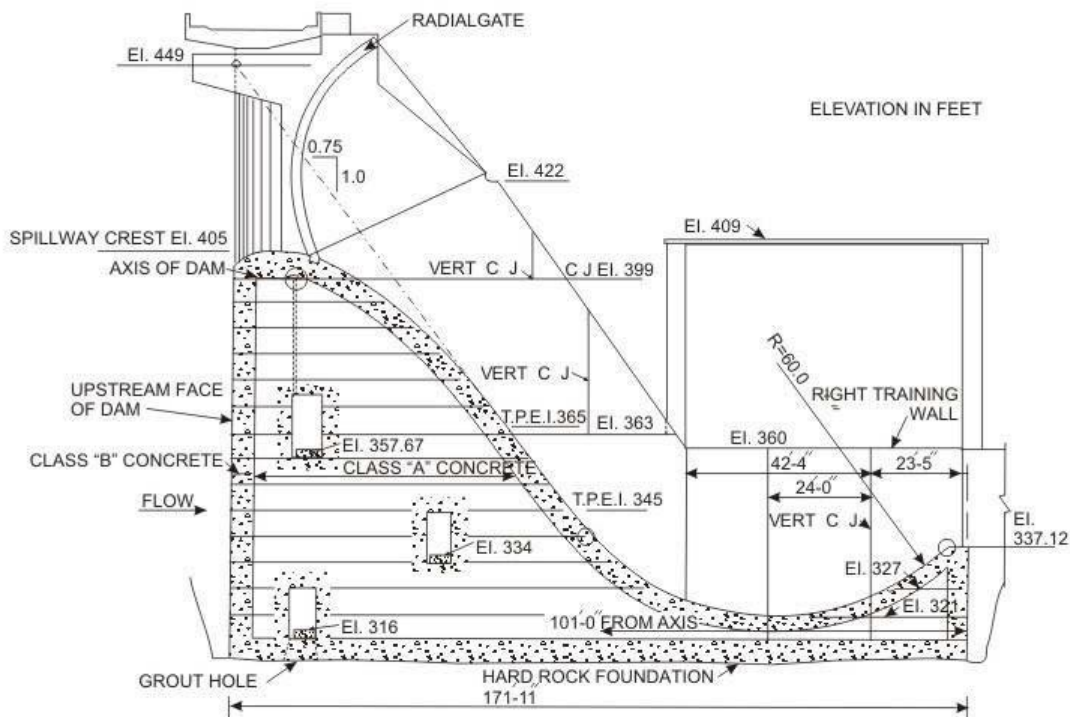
Typical overflow (ogee) spillway .Example of Panchet Dam on River Damodar
